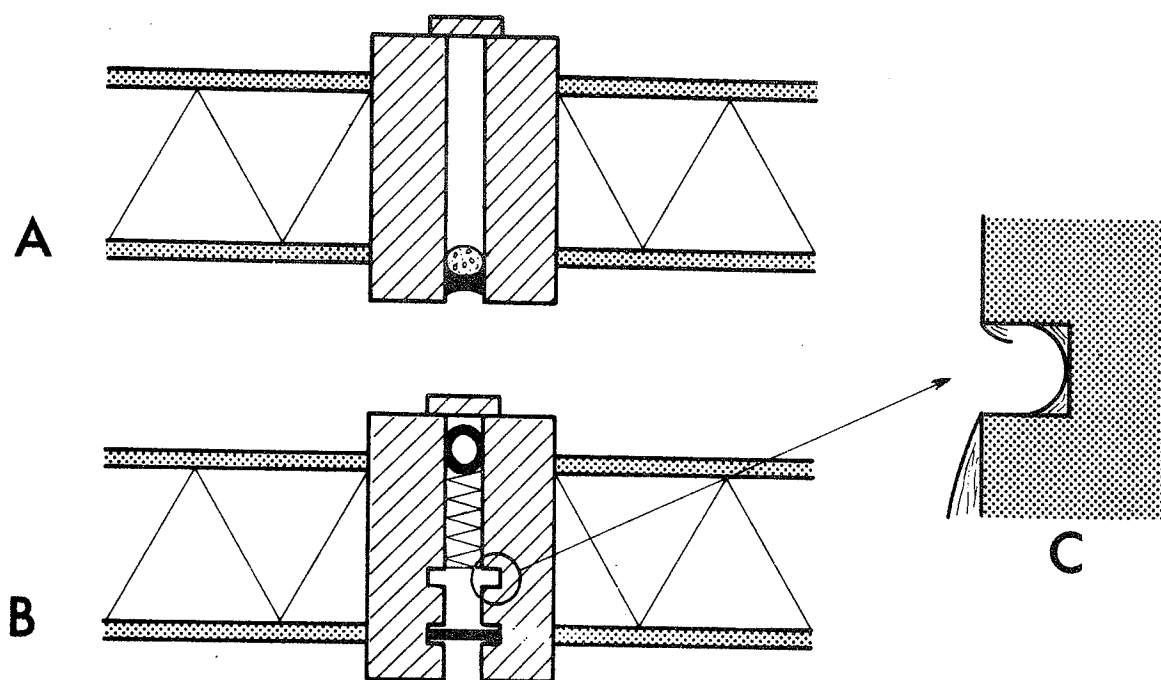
One- and Two-Stage Joints in Wood-Framed Facades.
